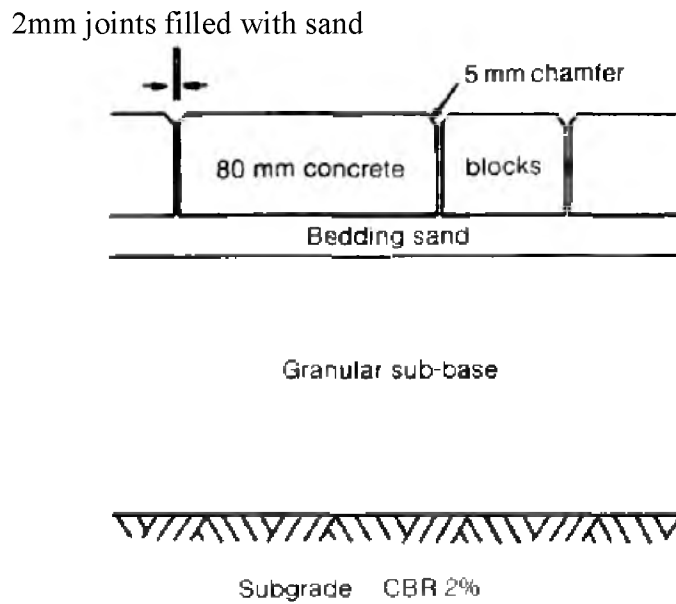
Typical Section of Segmental Block Pavement (Barber and Knapton 1979)
